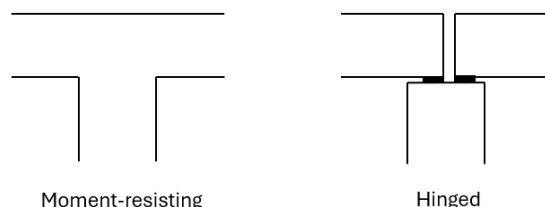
Sketch of the two designed double beam-to-column connections.
